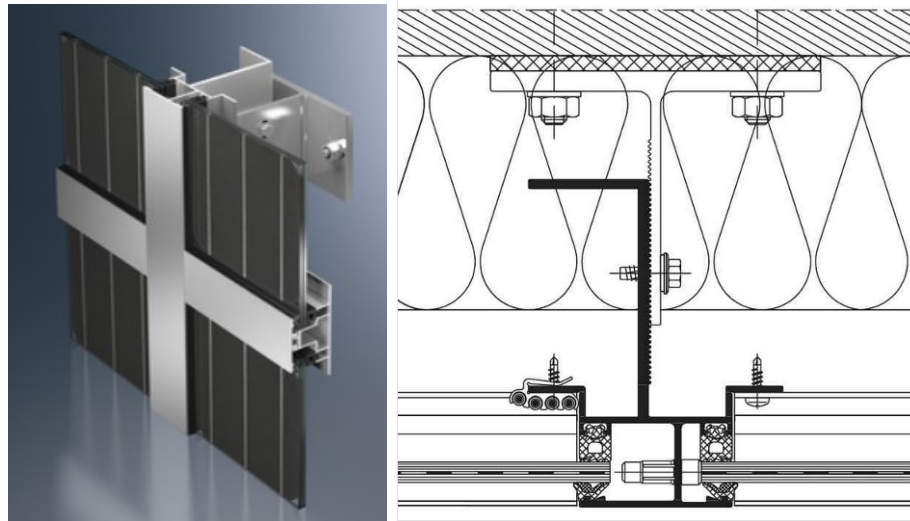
Detail of Schüco ventilated façade system for BIPV applications. Source: Schüco
